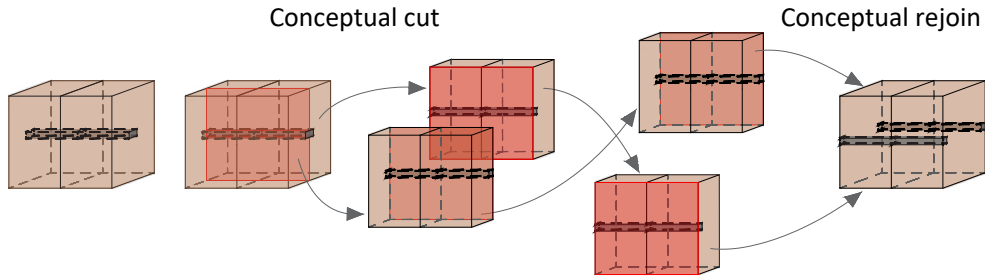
Schematic illustration of specimen concept: Transfer of a single-shear timber-to-timber connection with an inner fastener (left) to outward facing fasteners (right).
